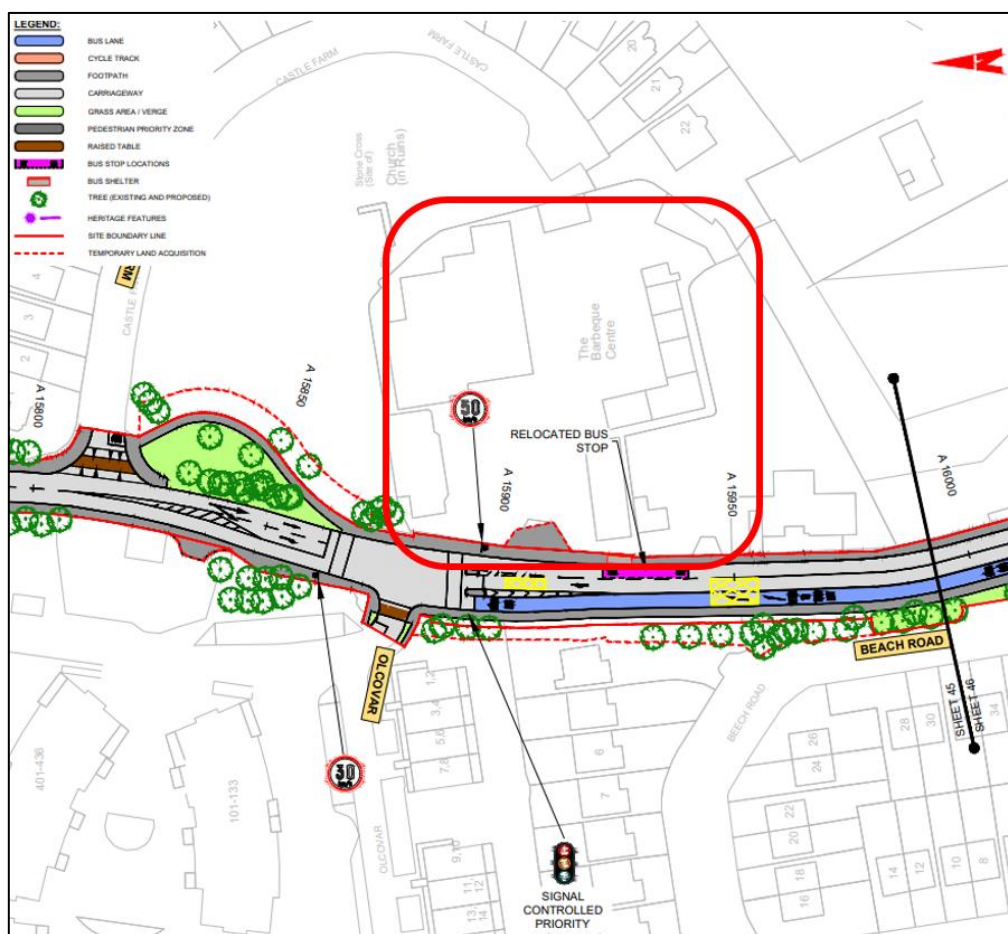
Extract from General Arrangement Drawing at Dublin Road (Sheet 45)
